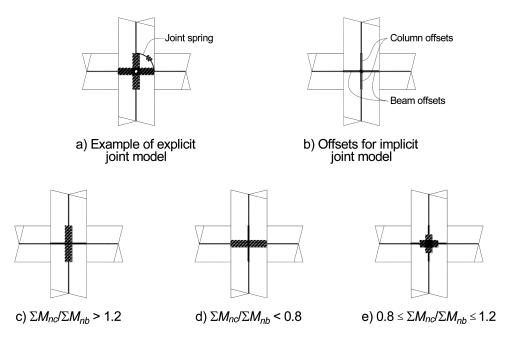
Beam-column joint modeling (note: hatched portions indicate rigid element).
